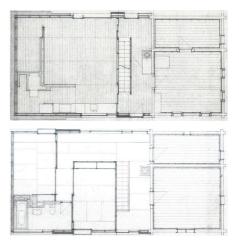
Original Plans of the house Gugalun house. At the left, the ground floor.
